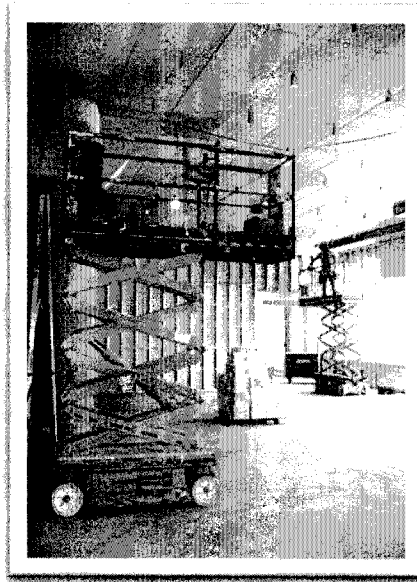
Installation of false ceiling (Rodriguez, 2009)
